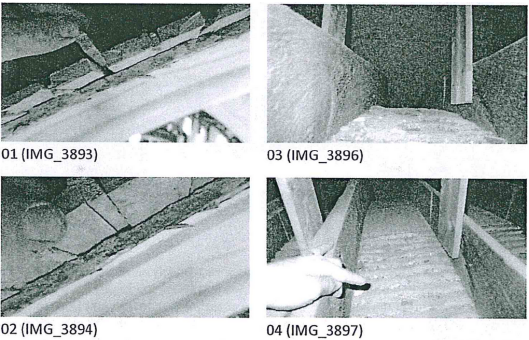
/ 02 view of loose plaster key and de-bonding of the plaster . Image 03 and 04 approximately 50 % of the plaster keys are damaged. It is likely that some of the damage to the plaster came about because of vibration from tools used to cut the opening. The plaster is in fair to good condition. Some damage was observed to the roof rafters north of the opening. There is a significant space between the plaster and the roof which would allow for insulation and venting.
